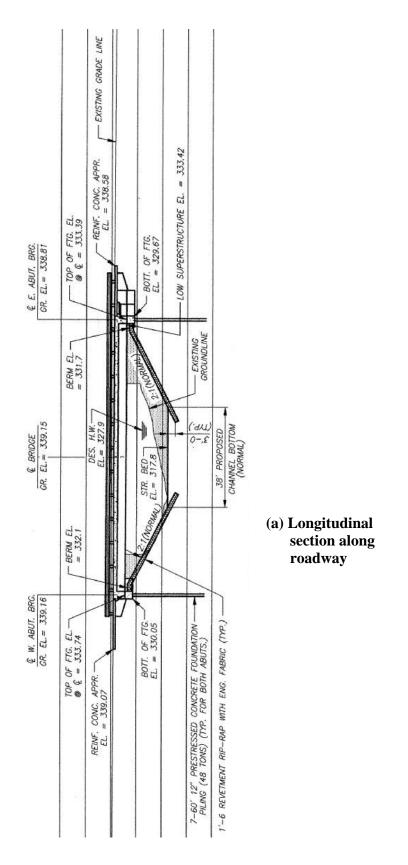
Design drawing for the Tama County Bridge (courtesy of Iowa DOT)
